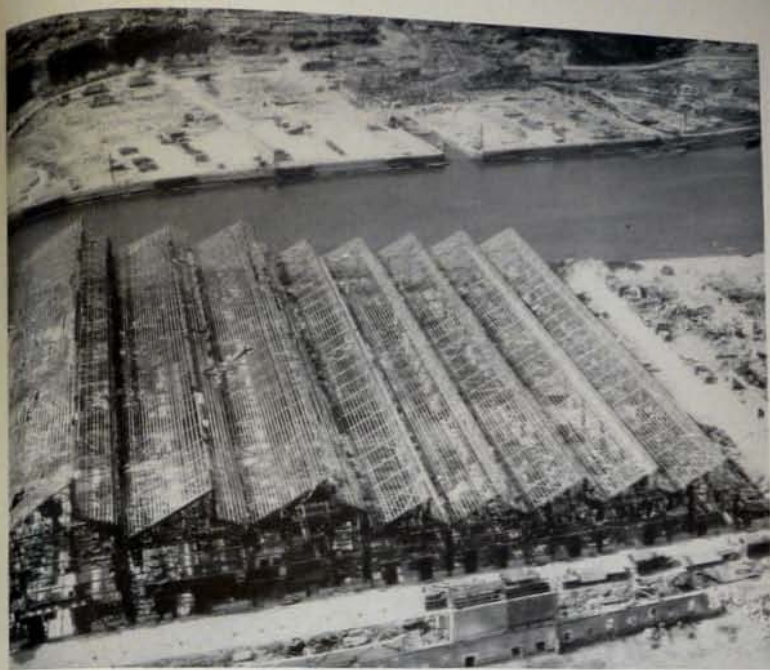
5,600 feet from GZ. Group 36, Building 8. Aerial view of damage to roof.
